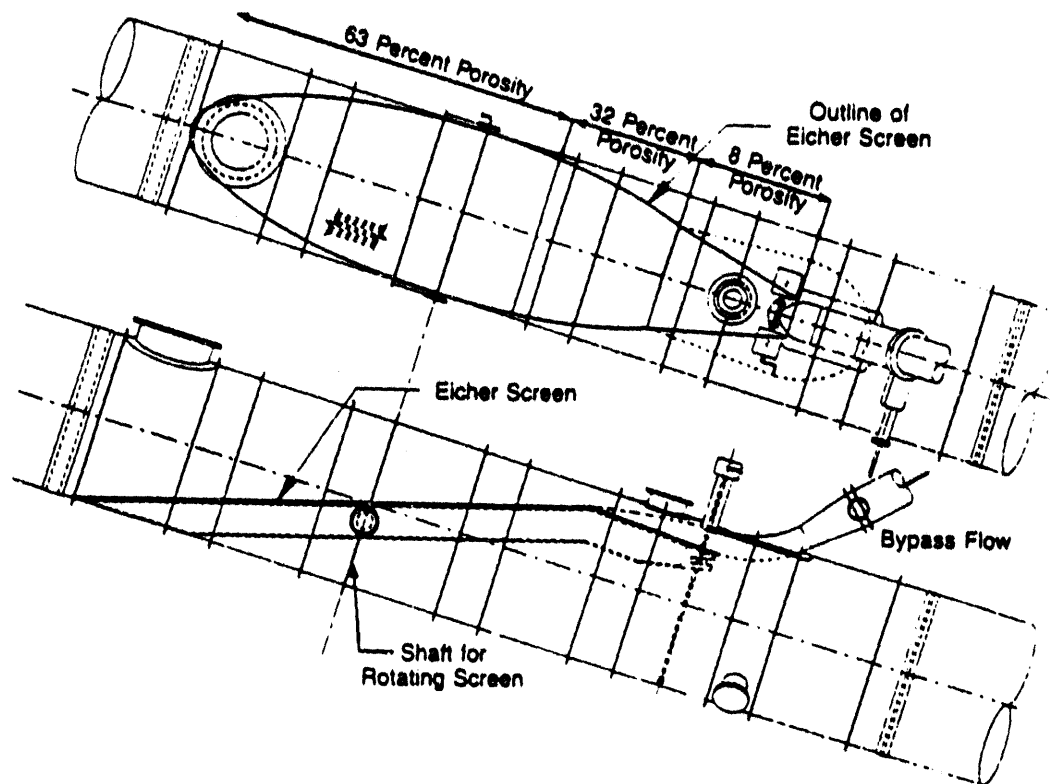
Plan and Section Views of the Elwha Eicher Screen (courtesy Harza Northwest and Hydro Review).
